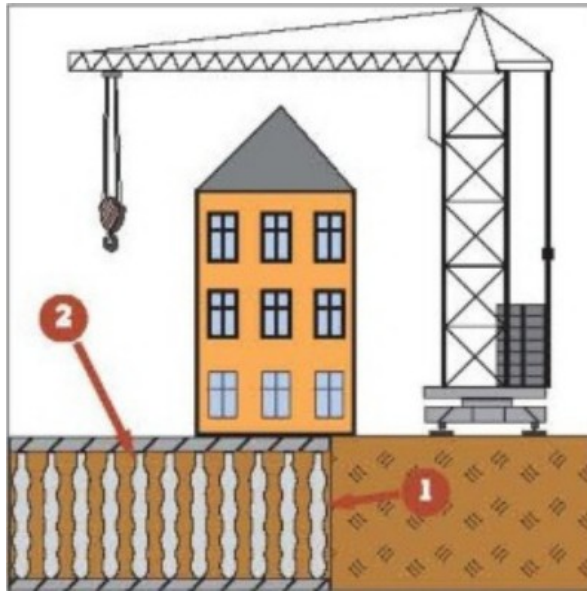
Retaining wall of RIT piles. 1: RIT pile; 2: capping beam.
